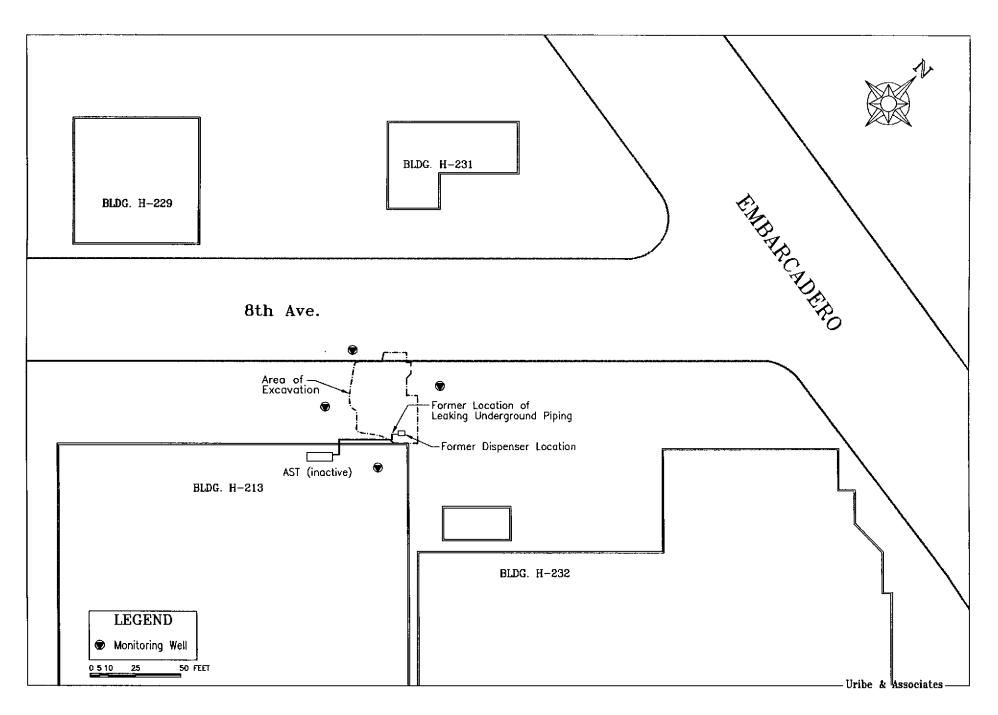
Site Plan, Showing Proposed Monitoring Well Locations
